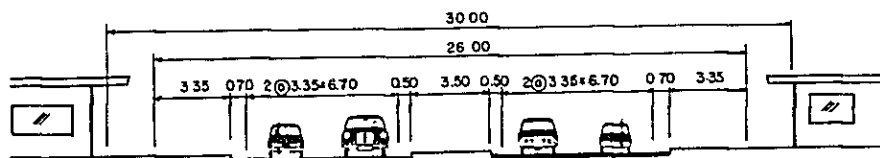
LONG TERM CROSS SECTION OF VIA EL PAICAL
